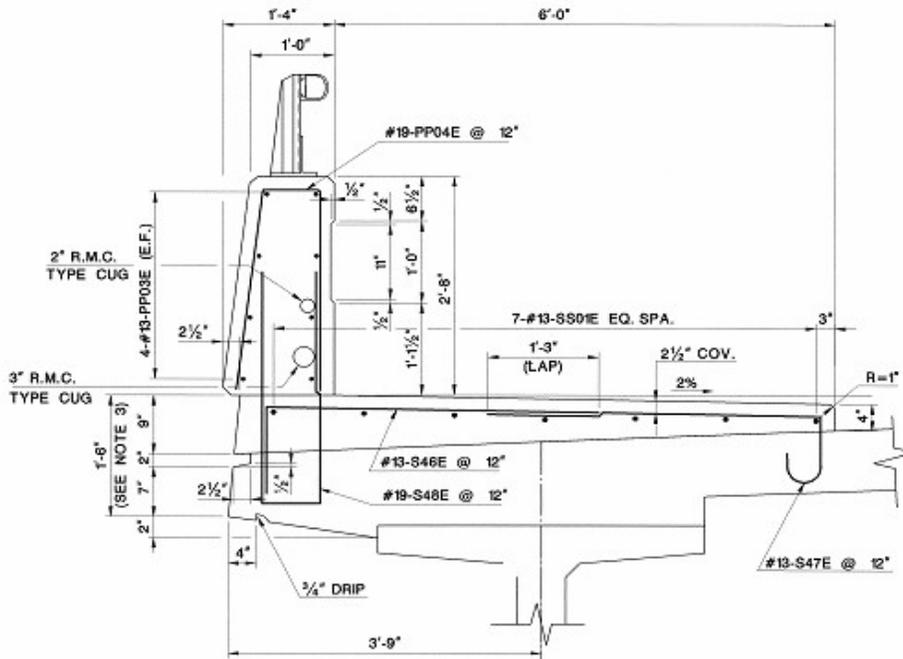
2'-8" Parapet WB Sidewalk (North)
